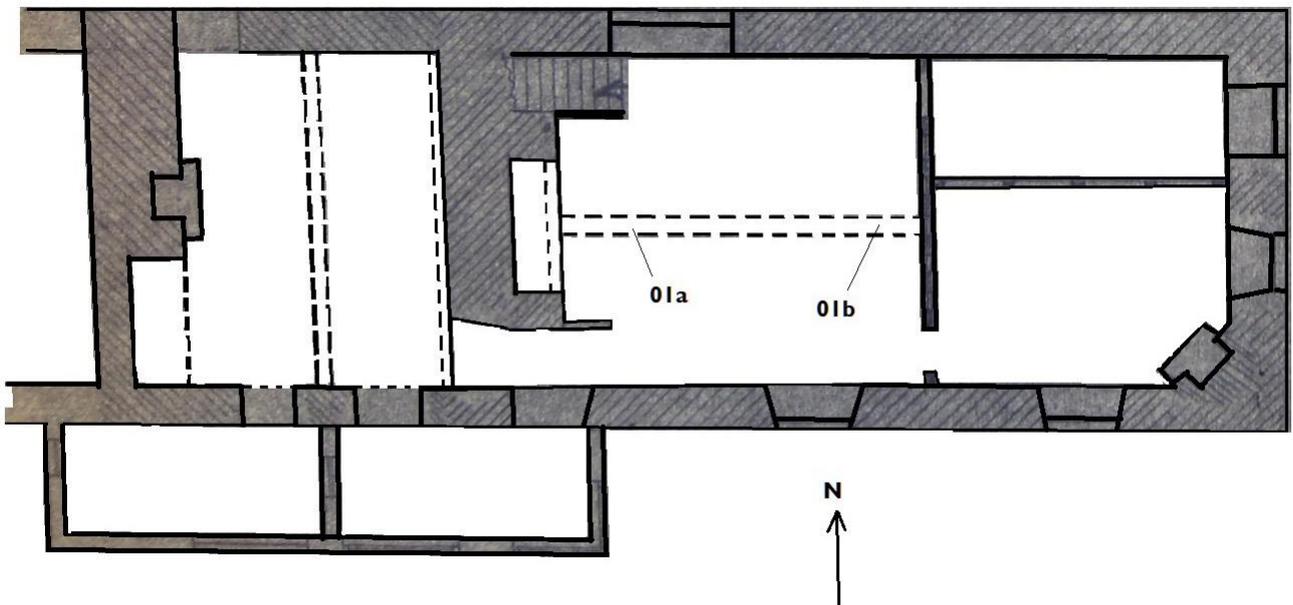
Ground floor plan showing the axial beam sampled in two places, adapted from an original drawing by Ffrangcon Lloyd
